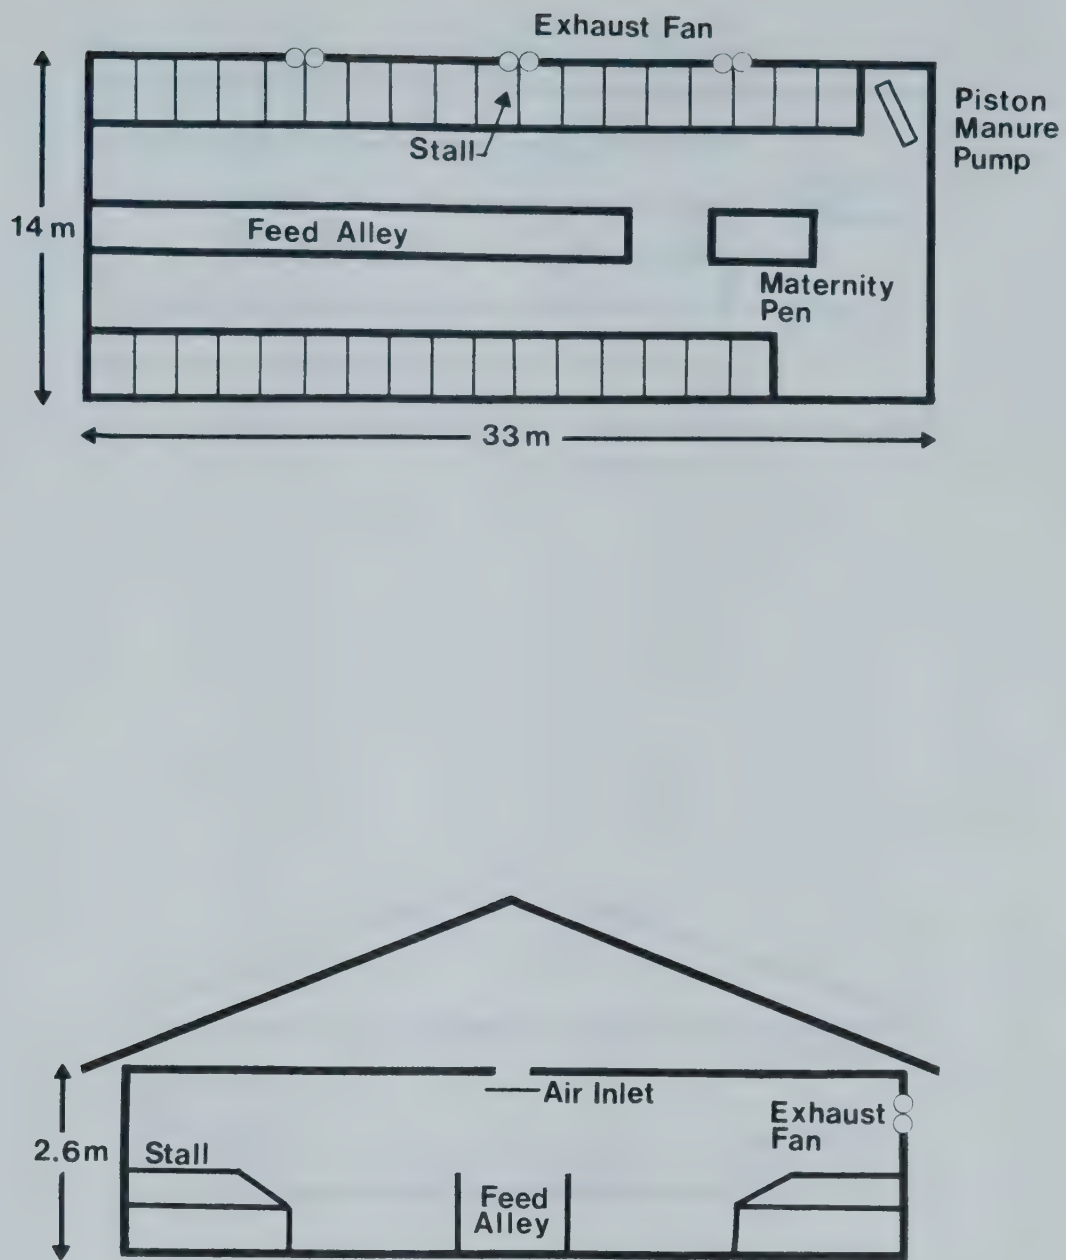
Barn SO-2 – floor plan and cross-section.
